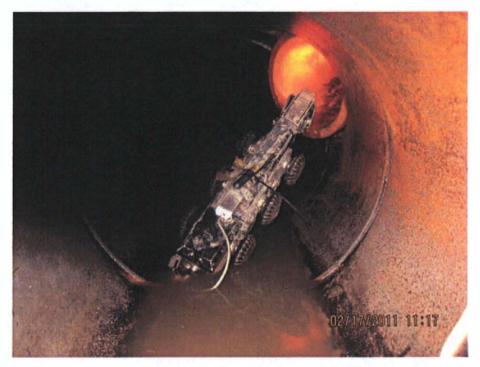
Camera positioned prior to entry for video inspection of Jorgensen 10-inch Lateral.
